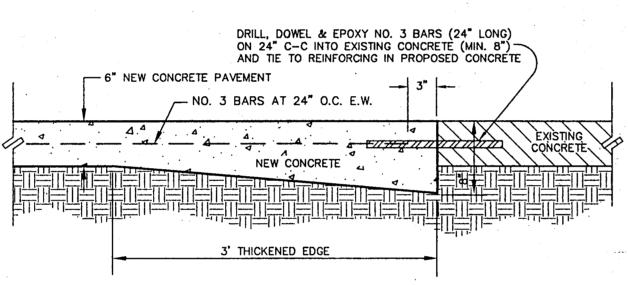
DETAIL OF PAVEMENT JOINT AT CURB NOT TO SCALE
